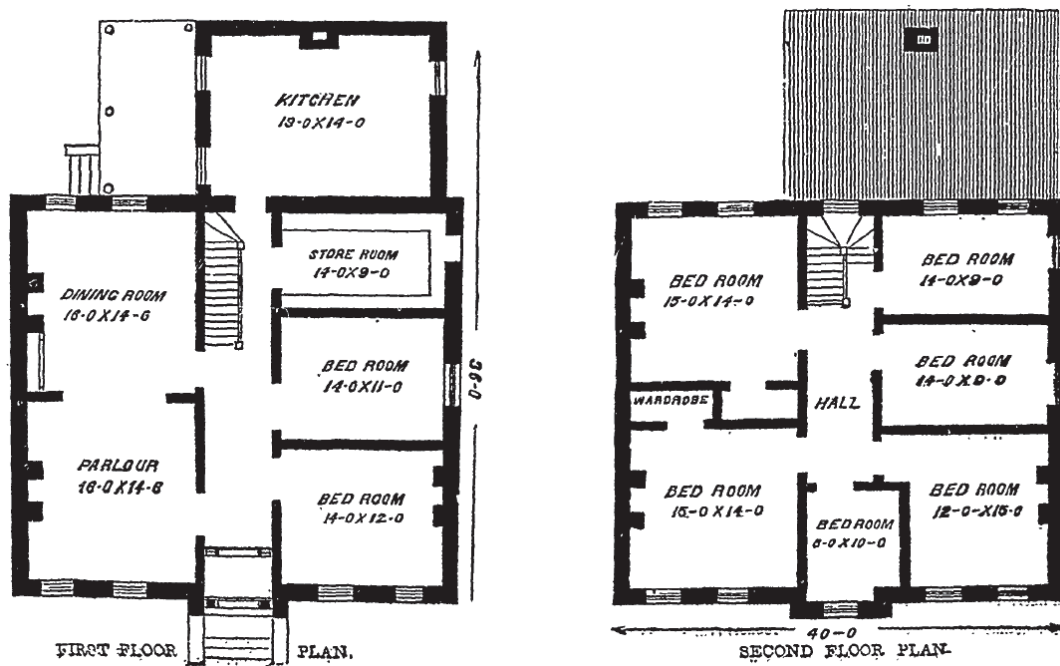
Two-Storey Farmhouse, plan [Canadian Farmer, 1865]
